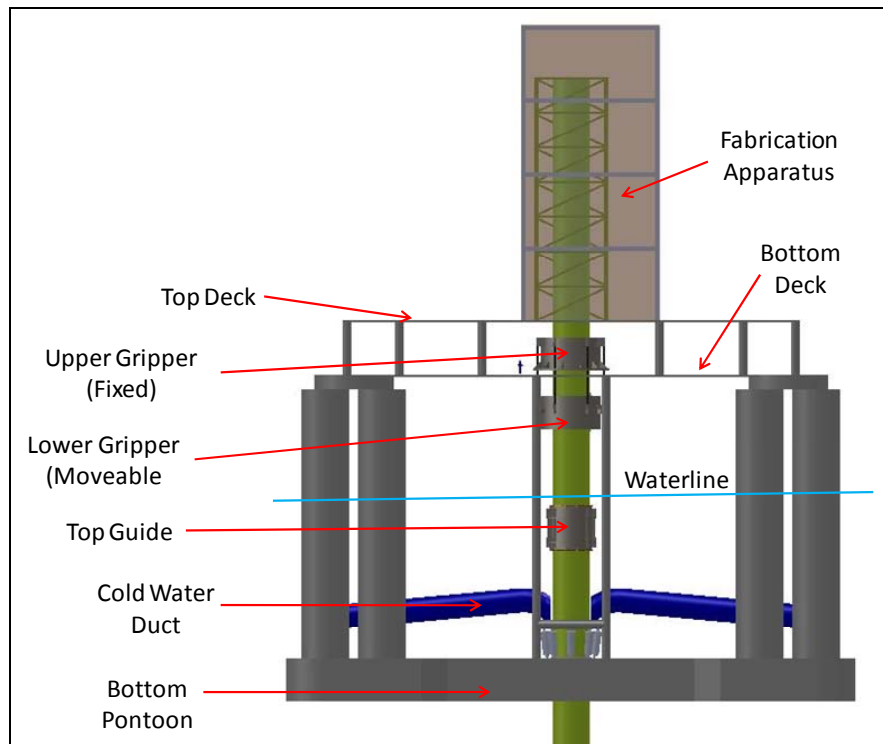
4m CWP Fabrication and Pipe Handling Equipment
